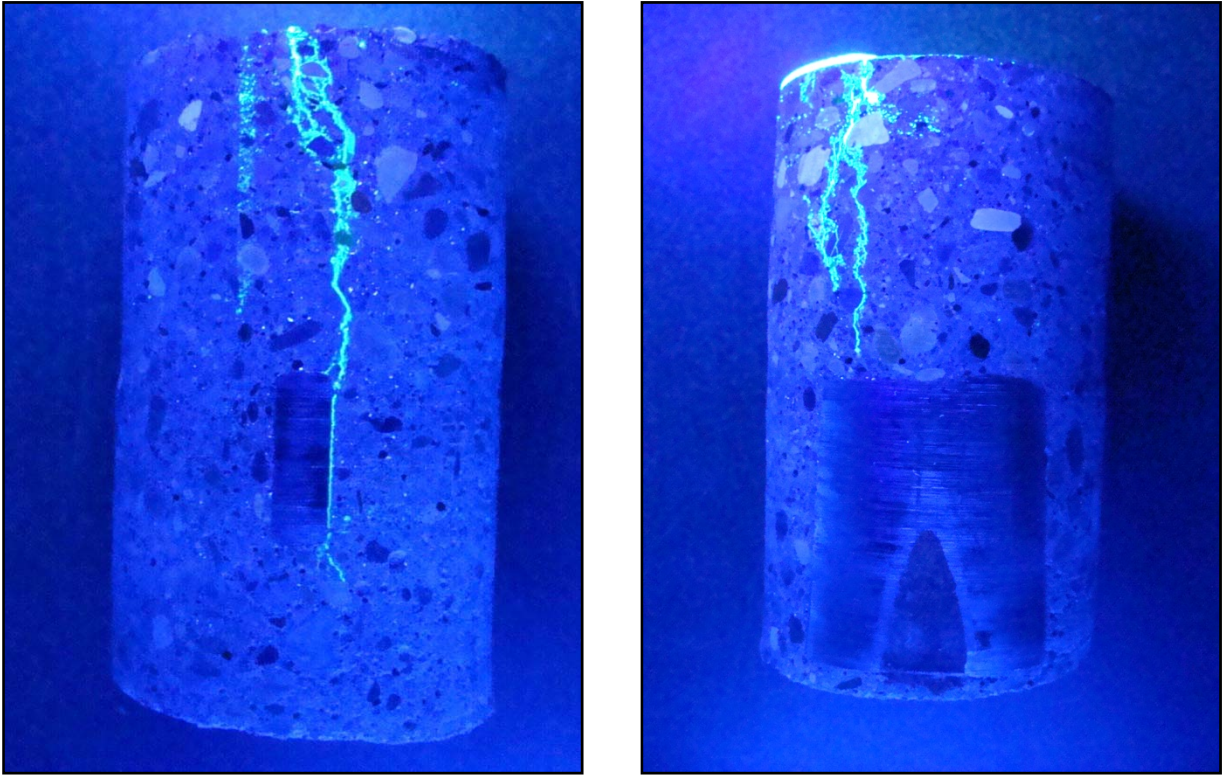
Core C1 (left) west elevation; (right) east elevation
